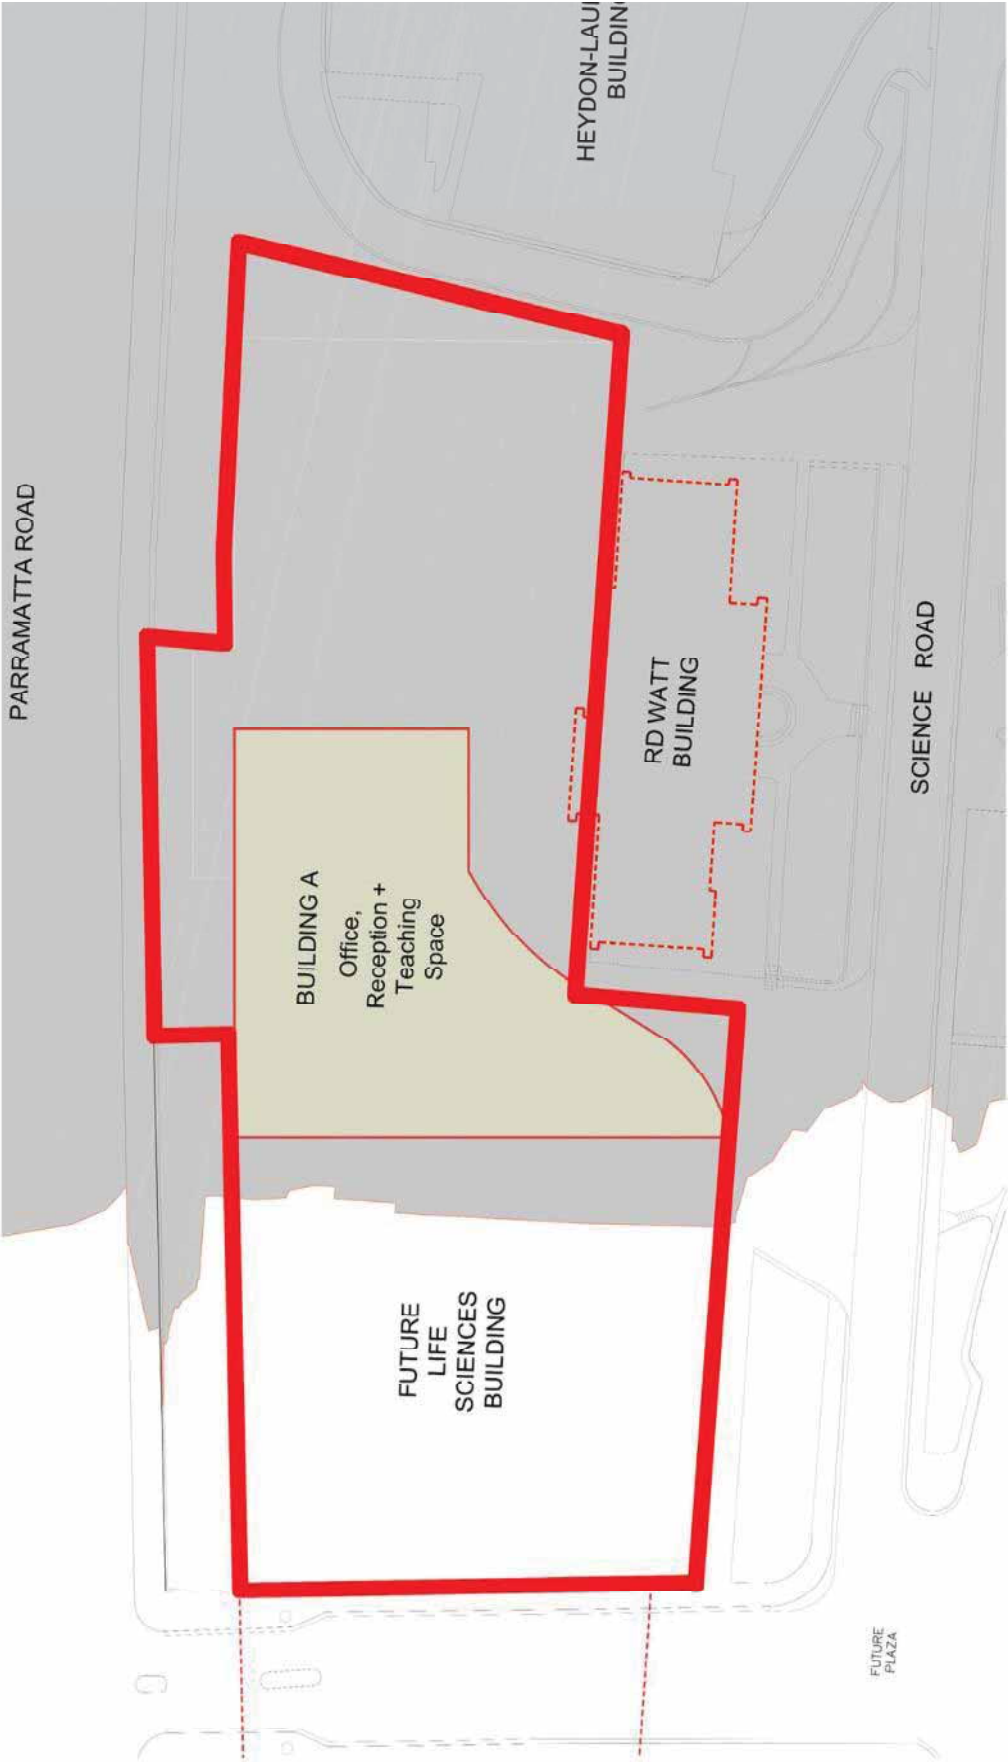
Proposed development plan for FASS building, the footprint is outlined in red. (Source: BatesSmart Architect Pty Ltd 2015)
